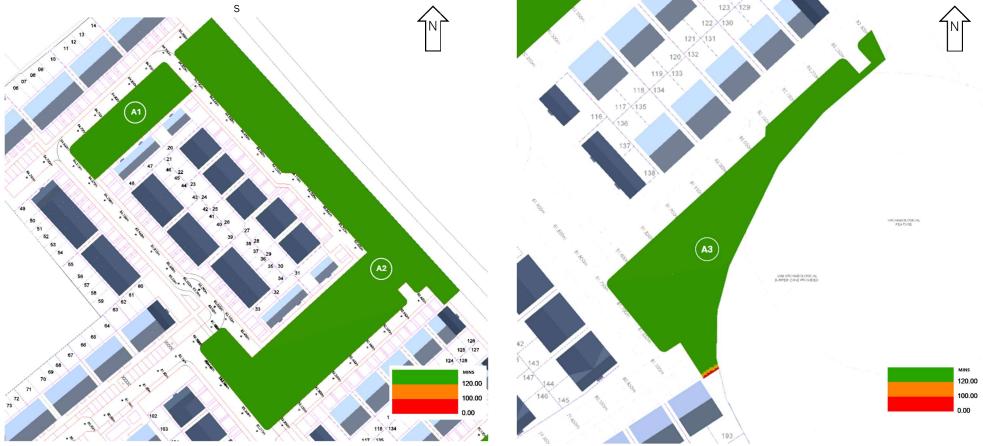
Proposed Open Space A1 & A2 - 2hr Sunlight Test
